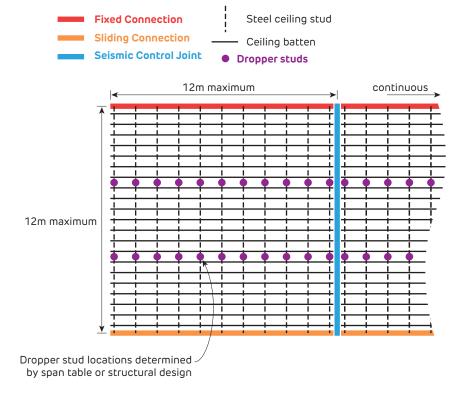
Stud Ceiling Type A3 - Fixed / Sliding
